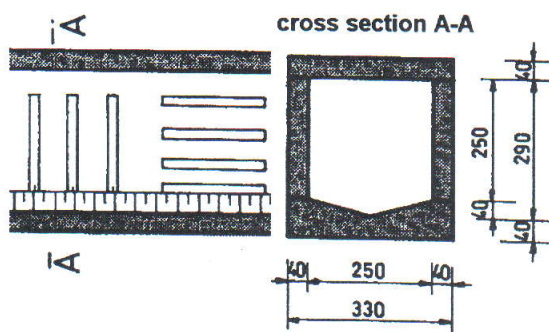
Arrangement of rectangular drainage pipe, an example, dimension in mm.
